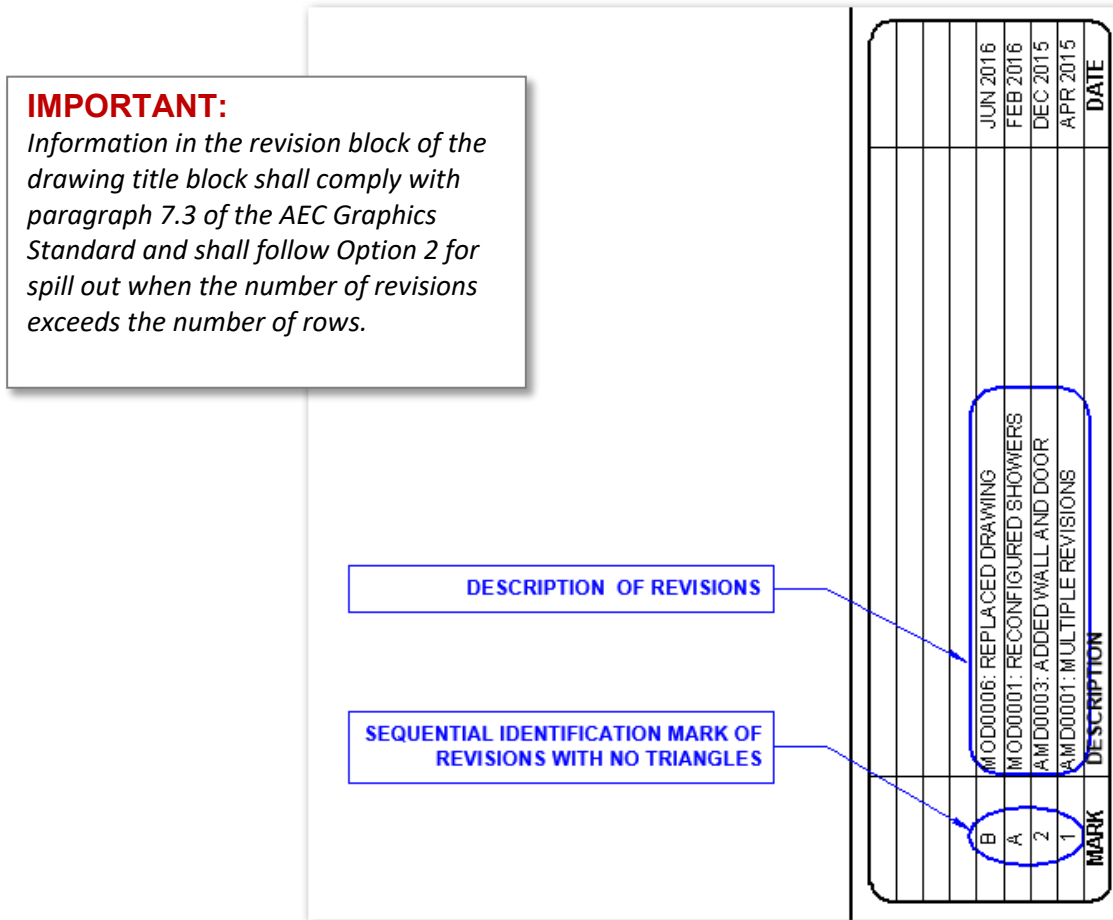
Figure C: Example of Revision Block Showing Multiple Successive Revisions of One Sheet
